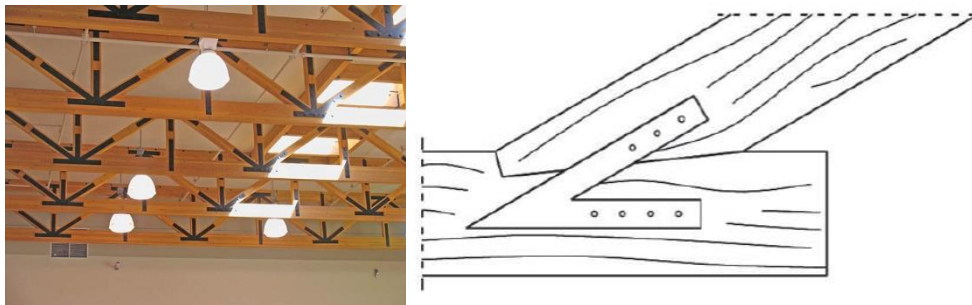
Truss connection with metal stirrups (Branco, 2009)
